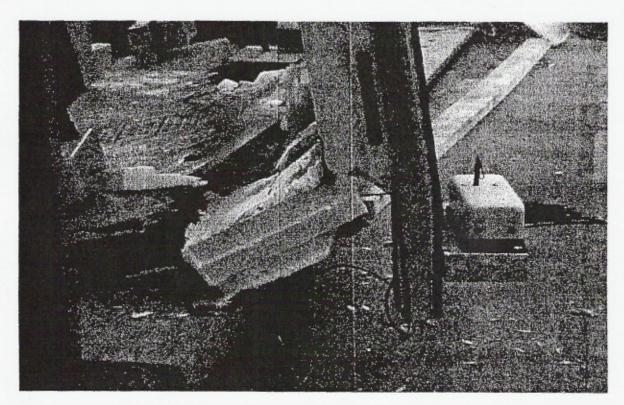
Closeup of Failure of 8' OSB-OSB Panel Under Compressive Loading
